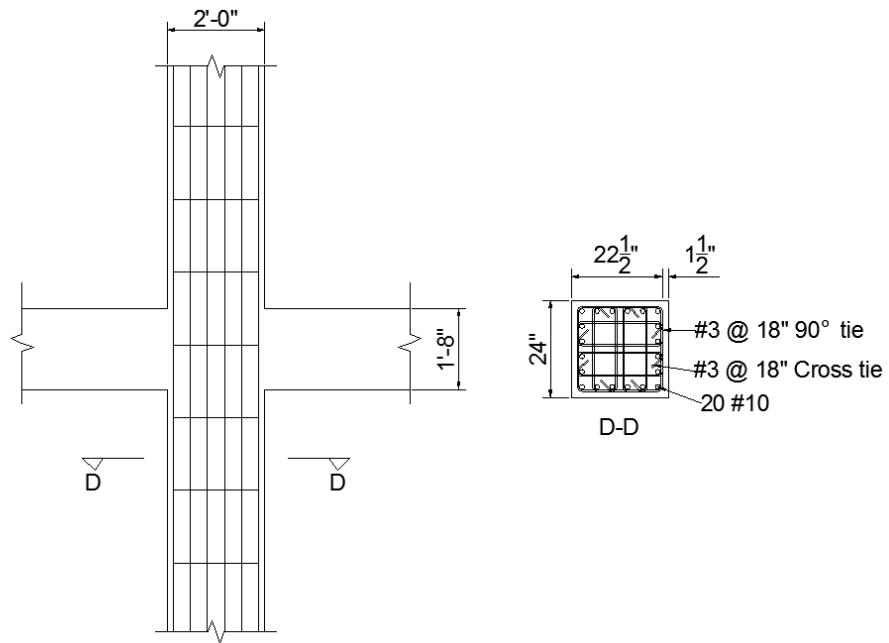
Reinforcement details for interior column of exterior frame 1 on the first floor
